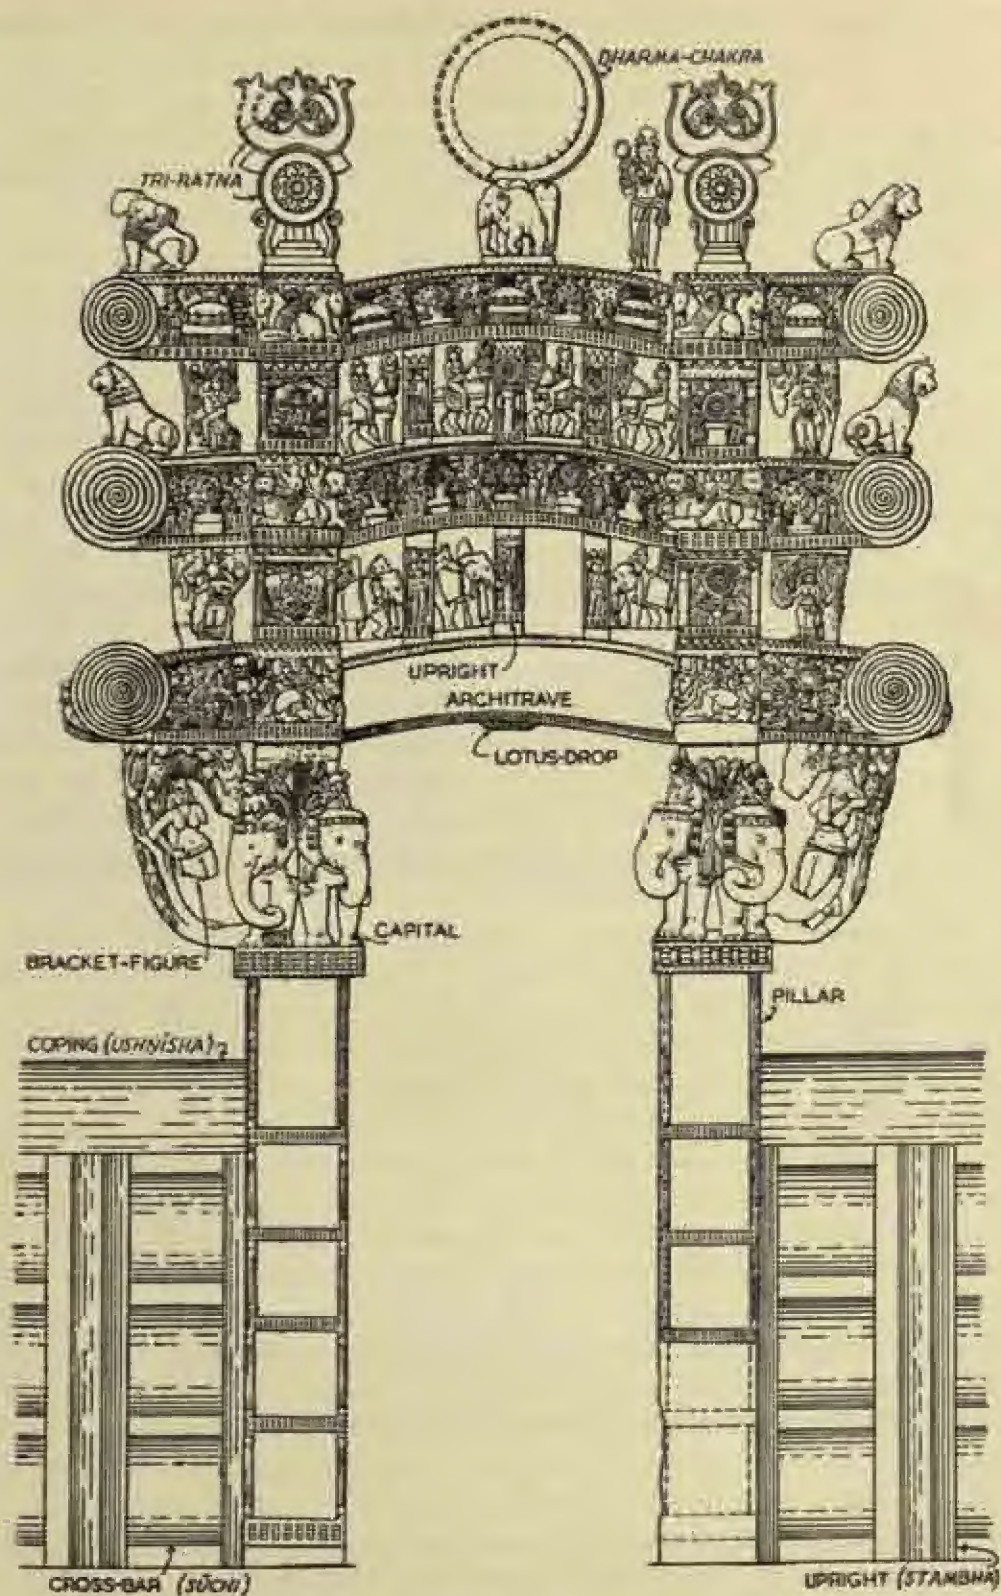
Sanchi: northern gateway of Stupa 1, front elevation
